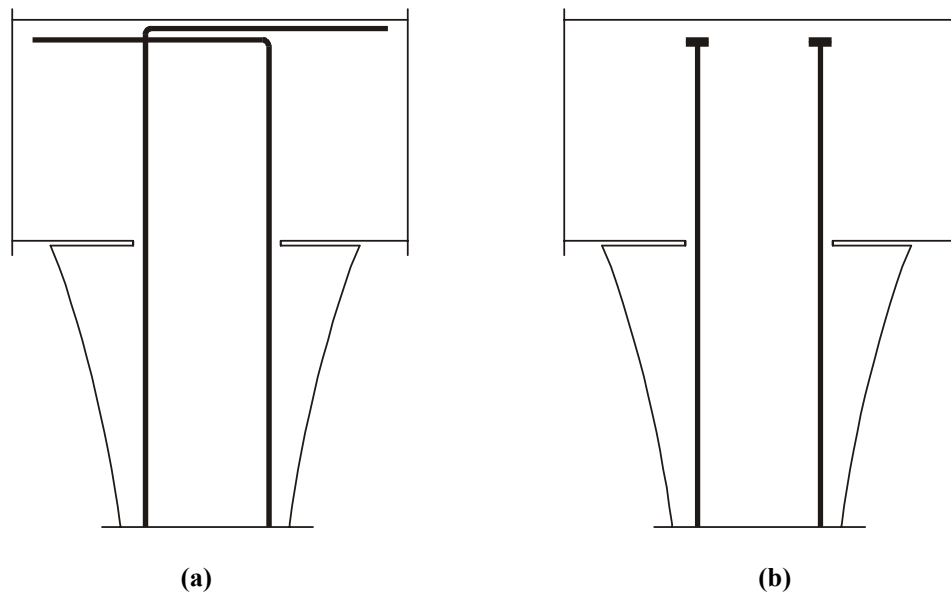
Alternative Beam-Column Connection Detailing (a) Column Reinforcement extended in the beam (b) Headed Bars
